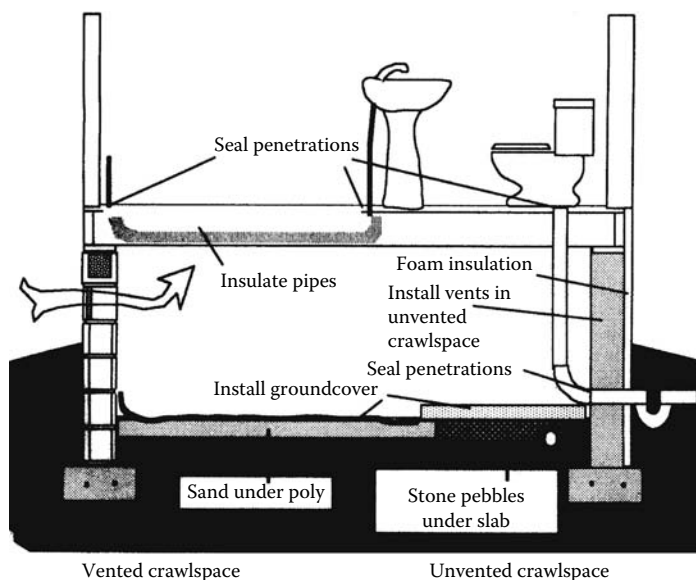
Summary of mechanical barrier approach for crawlspace foundations. (Adapted from U.S. EPA, *Radon-Resistant Construction Techniques for New Residential Construction—Technical Guidance*, EPA/625/2-91/032, U.S. Environmental Protection Agency, Washington, DC, February 1991.)
